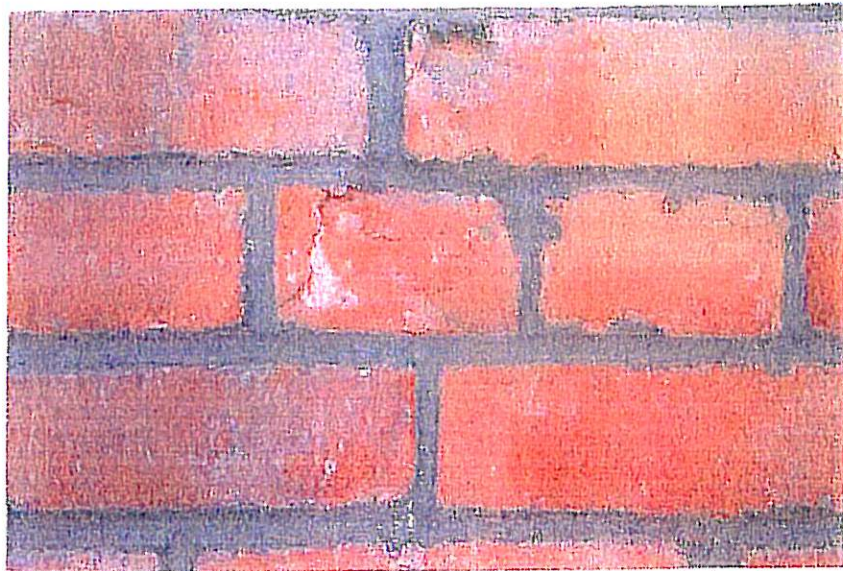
Detail of cementitious mortar with spalled brick. North elevation
